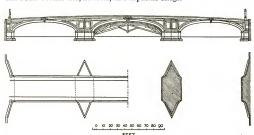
The Santa Trinità bridge, Florence. (Above) Elevation; (below) plan.
